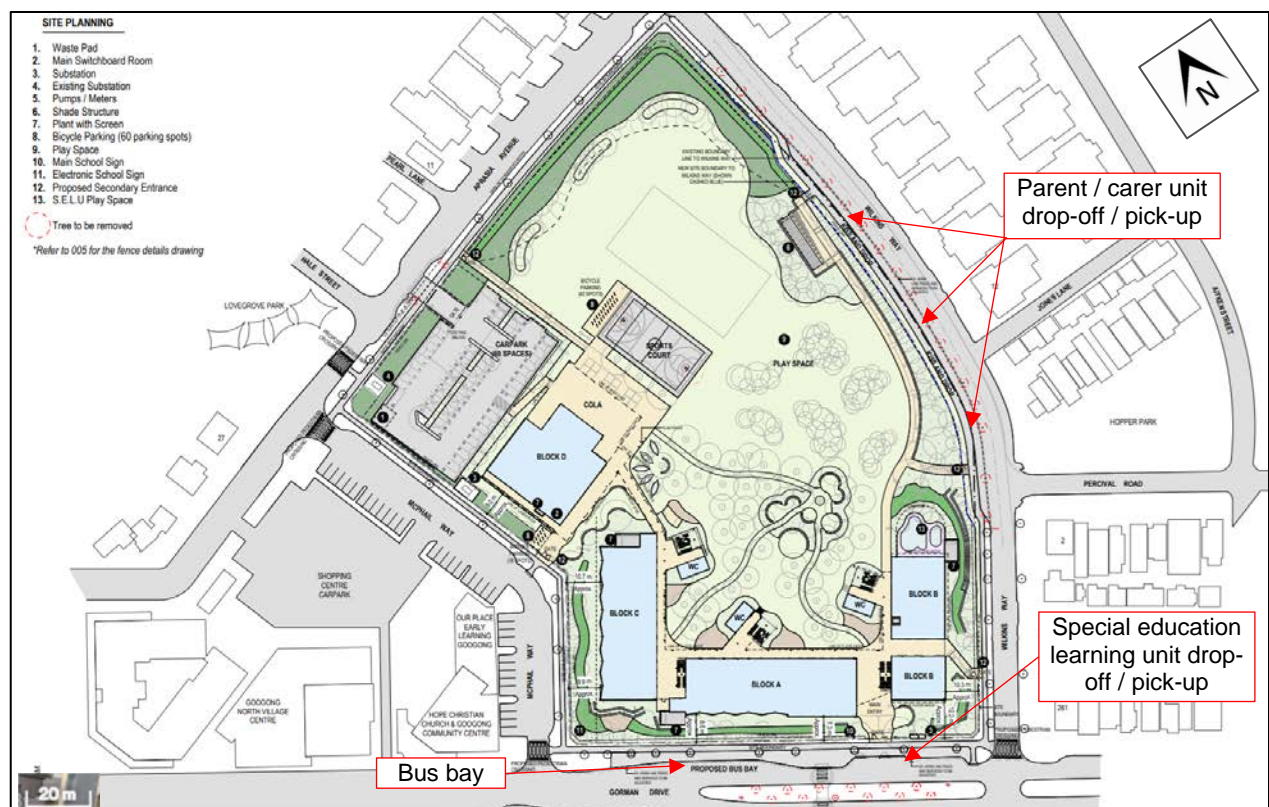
| Proposed site layout (Source: Applicant's RtS 2021)
